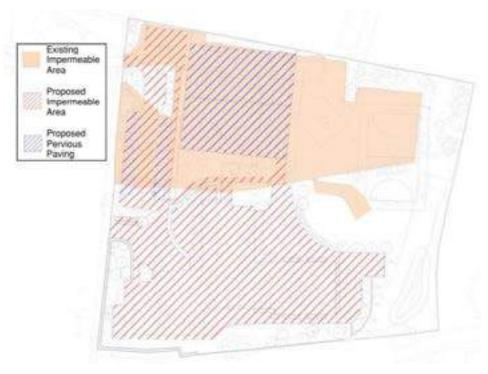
Llanilltud Faerdref Primary School impermeable area plan
